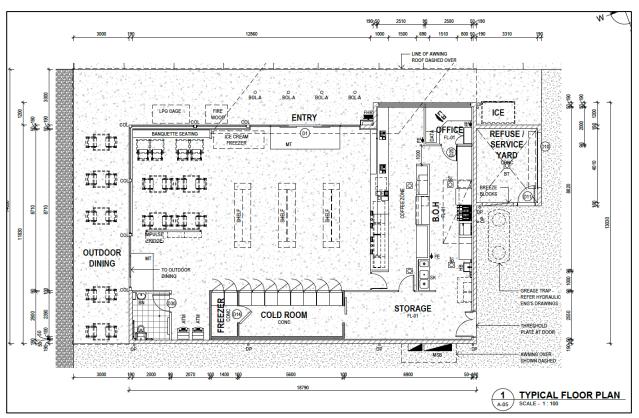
Extract from Floor Plans, prepared by Clarke & Prince Architects
